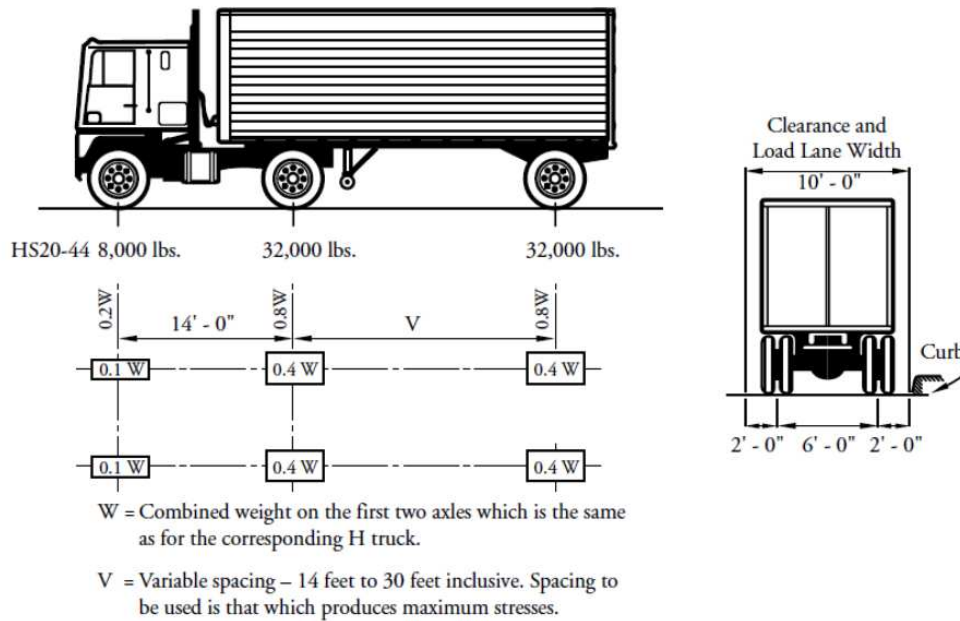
AASHTO HS20-44 Truck (Precast/Prestressed Concrete Institute, 2003)
